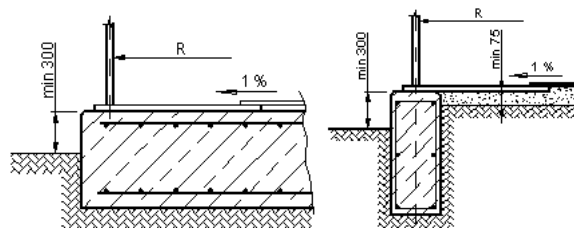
Typical concrete slab (left) and concrete ring (right) foundation (no scale)
